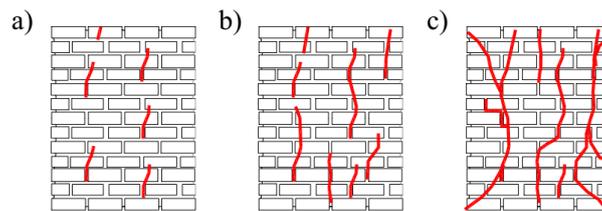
Phases of the wall destruction: a) first phase - appearance of small cracks, b) second phase - widening of cracks, merging of cracks and appearance of the first scratches, c) third phase - connection of scratches and cracks - the construction failure [4]
